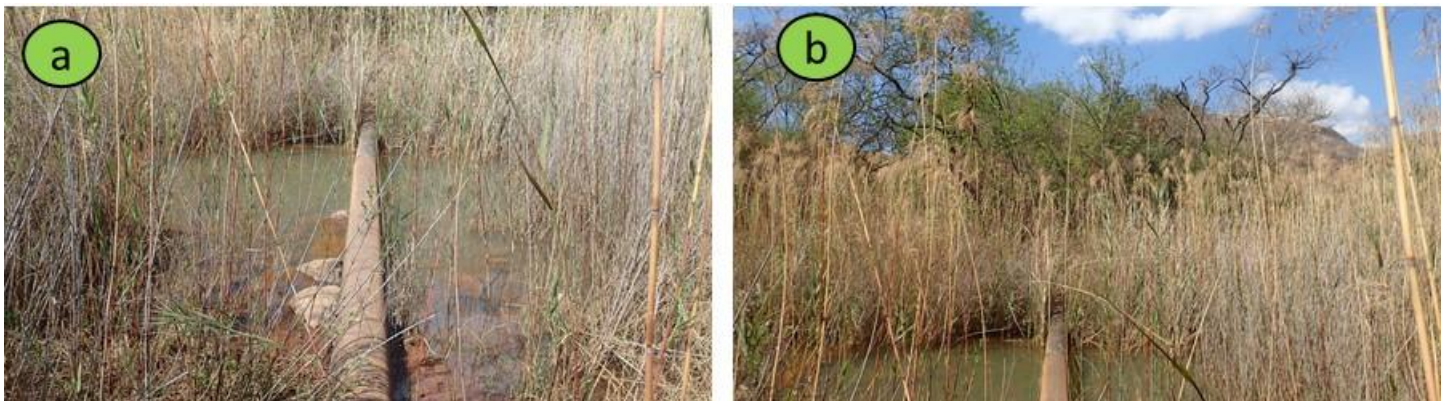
The area where the haul road will cross the Ngodwana spillway drainage by means of a low-level bridge.
